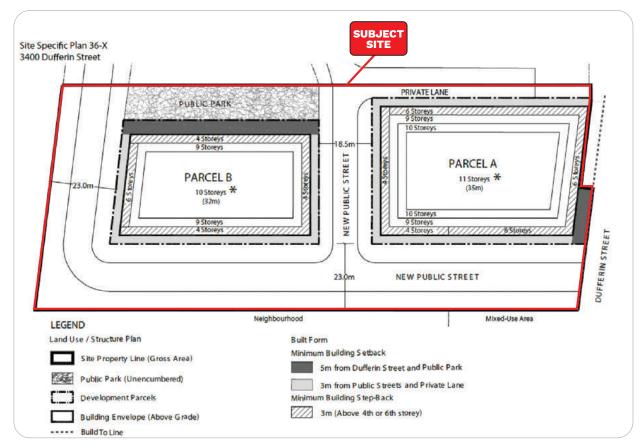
Dufferin Street Secondary Plan Map 36-15 (Site Specific Plan)
